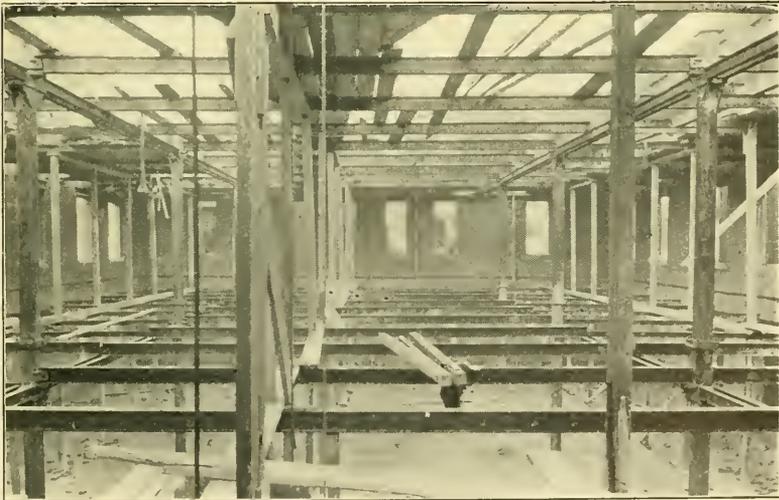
THE SALVATION ARMY WAREHOUSE.
